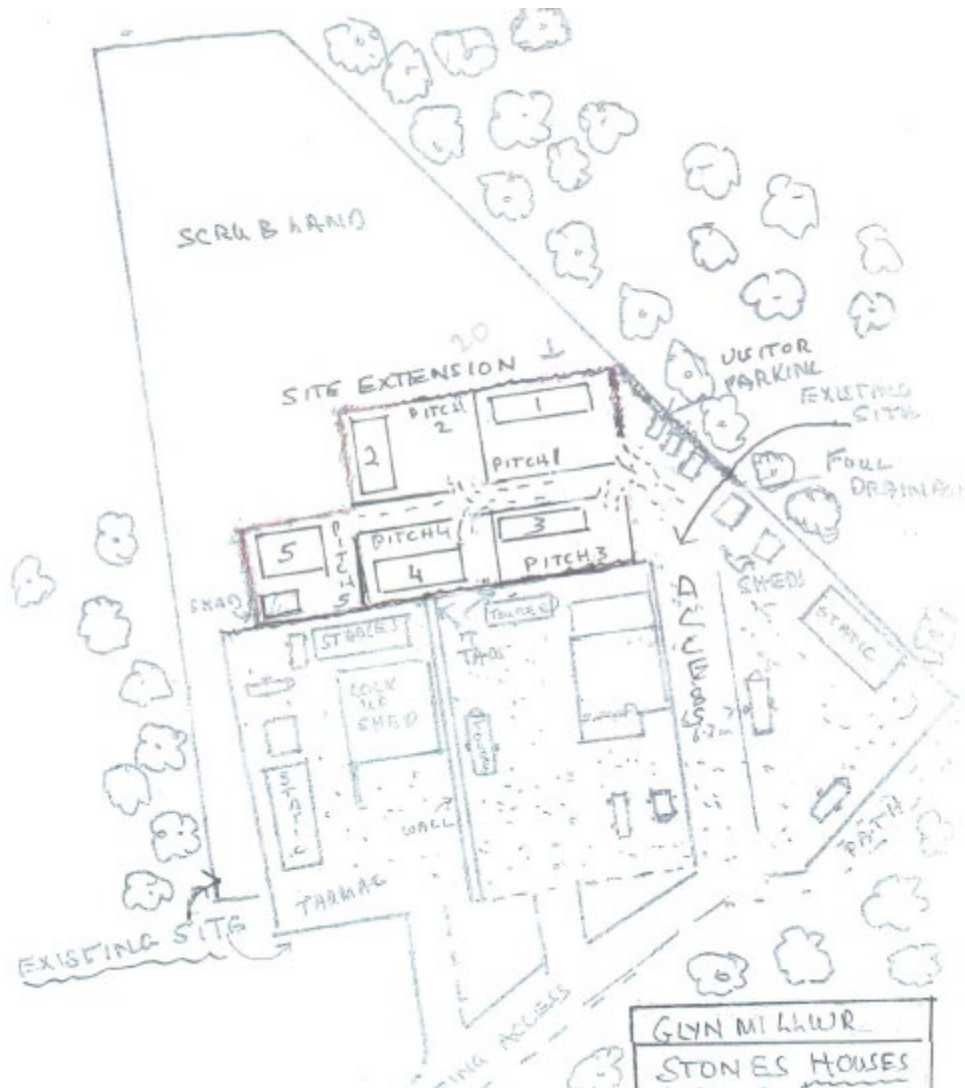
'Existing' Site Layout (at the time of submission of the application)
